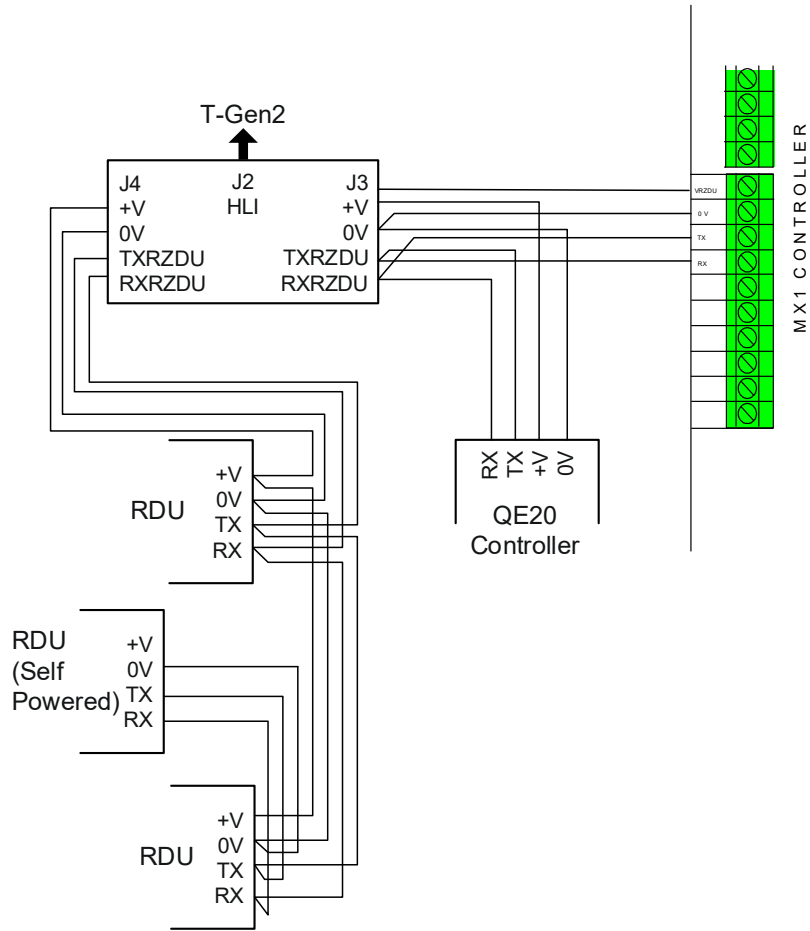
RZDU Wiring with T-Gen2 HLI Module
